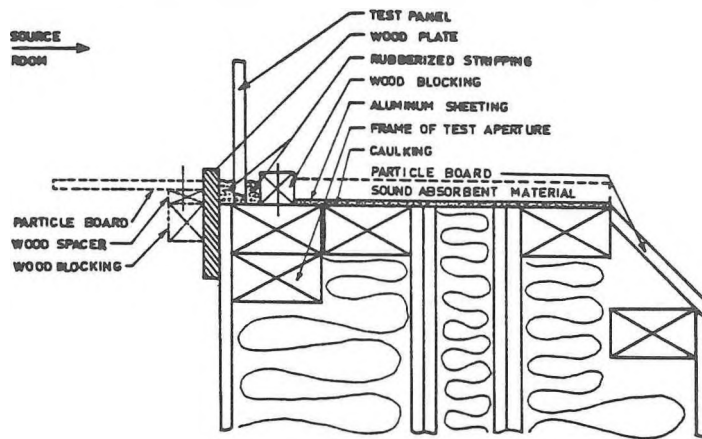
MOUNTING OF TEST PANEL ON FILLER WALL WITH SILL OR ABSORBENT MATERIAL
